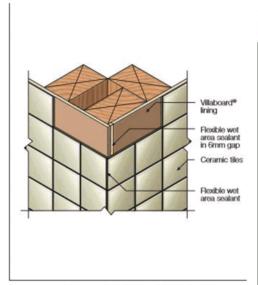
EXTERNAL TILED CORNER - NON SHOWER AREA NOTES
